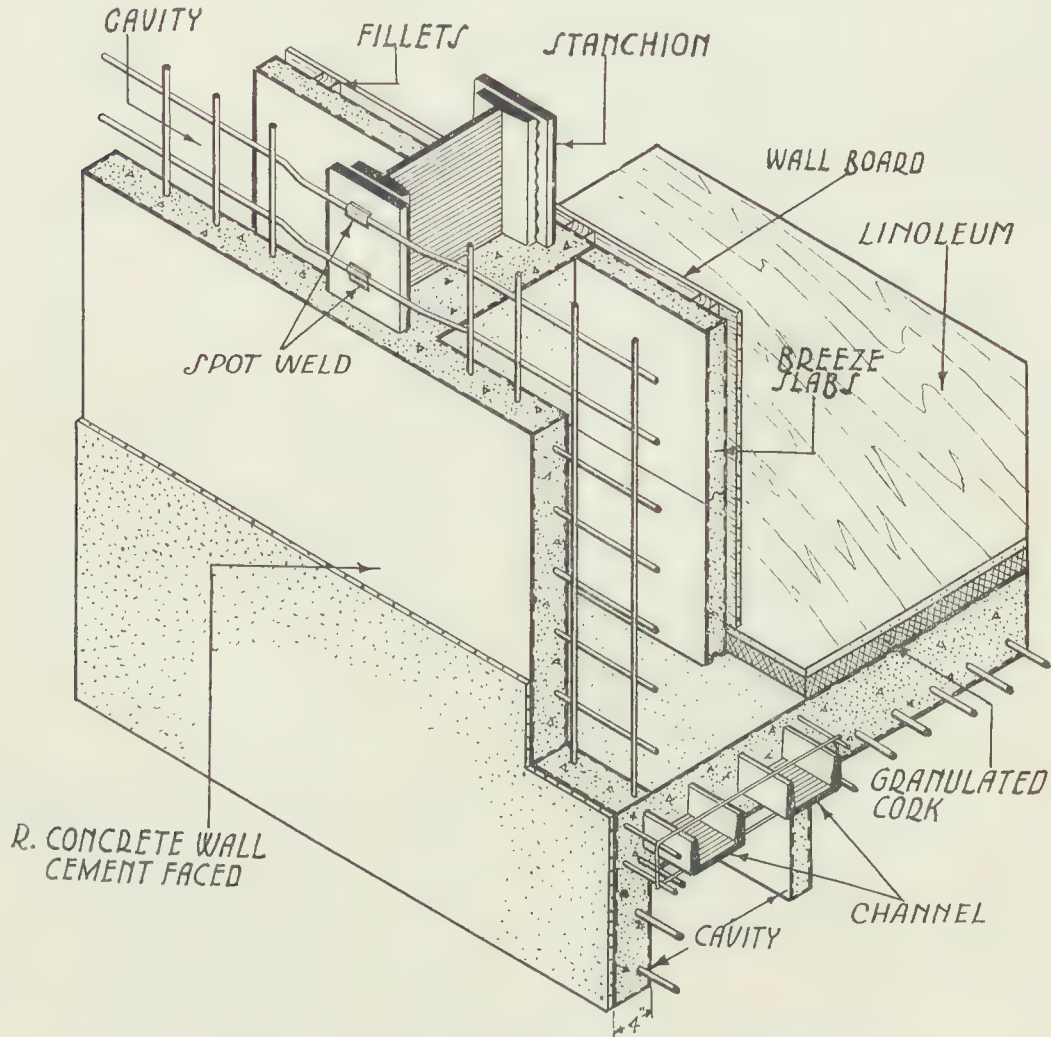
CAVITY WALL BUILT IN REINFORCED CONCRETE
